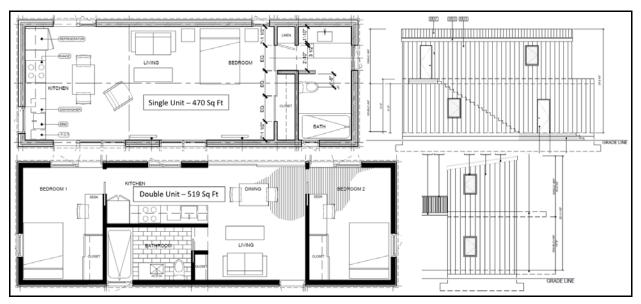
Proposed Employee Housing Units – Floor Plan and Elevations
